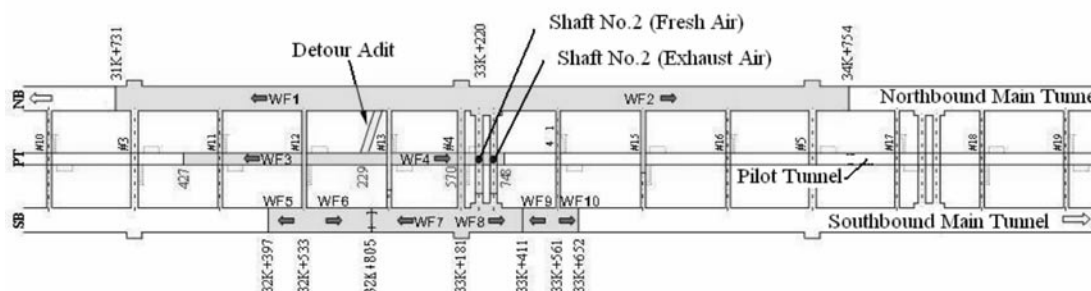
The Layout of Additional Working Faces through Shaft No.2
